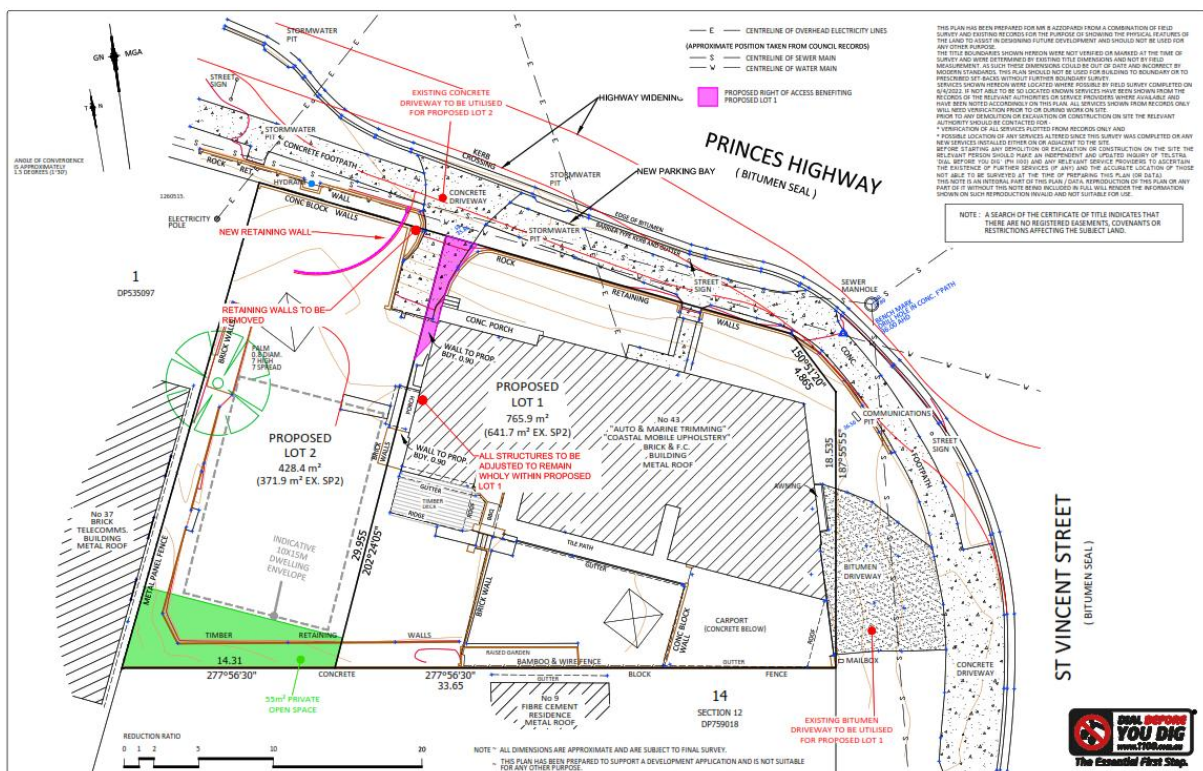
Plan of proposed subdivision depicting proposed lots 1 and 2.
